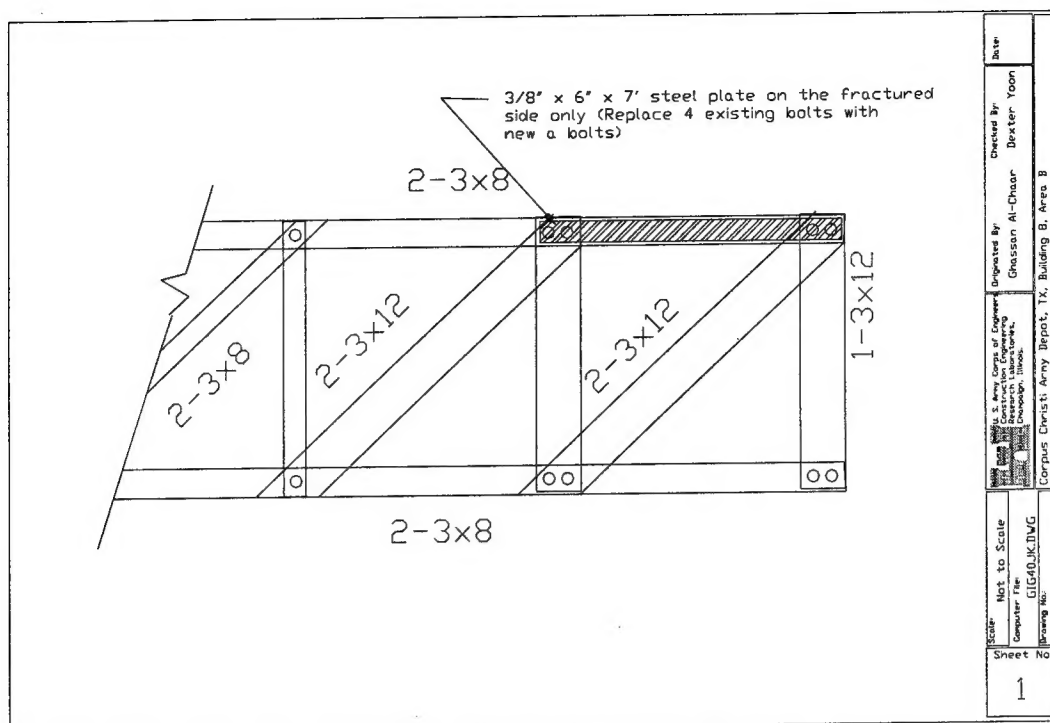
Proposed repair for member JK Truss Column Line 40, Section IG, Area B.
